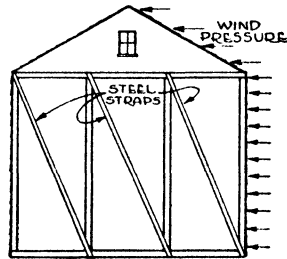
Sheathing Removed from End; Diagonal Steel Bracing Straps under Tension; Building Not Distorted
